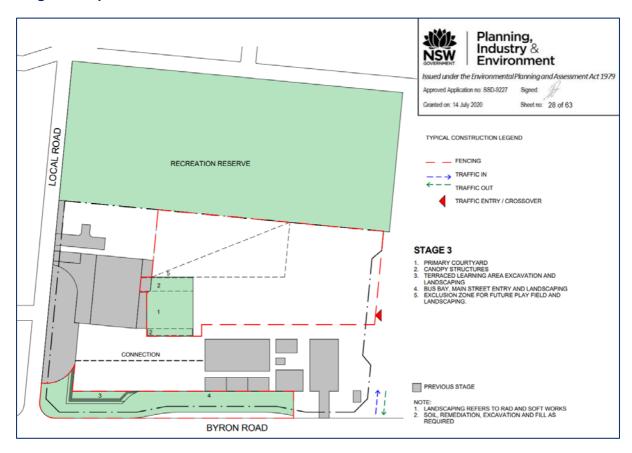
| Stage 3 site plan – as approved (Source: SSD-9227 Approved Plans)
